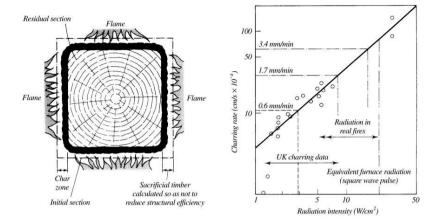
Effect of fire on structural timber sections. Once the structural size has been established, extra thickness can provide insulation. The thickness required for a specific period of fire protection for a particular type of timber can be derived from its charring rate. (Adapted from material in Fire Research Note 896 published by the BRE)
